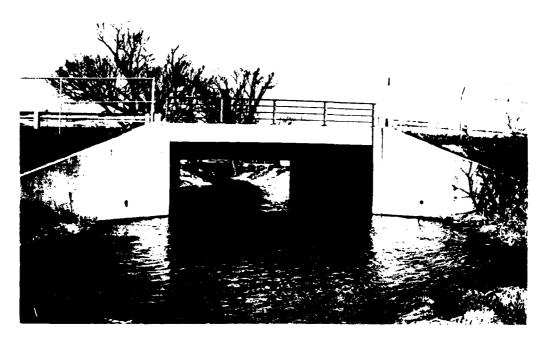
View of downstream side of Beahan Road bridge, mile point 1.30. Photo taken April, 1975.
